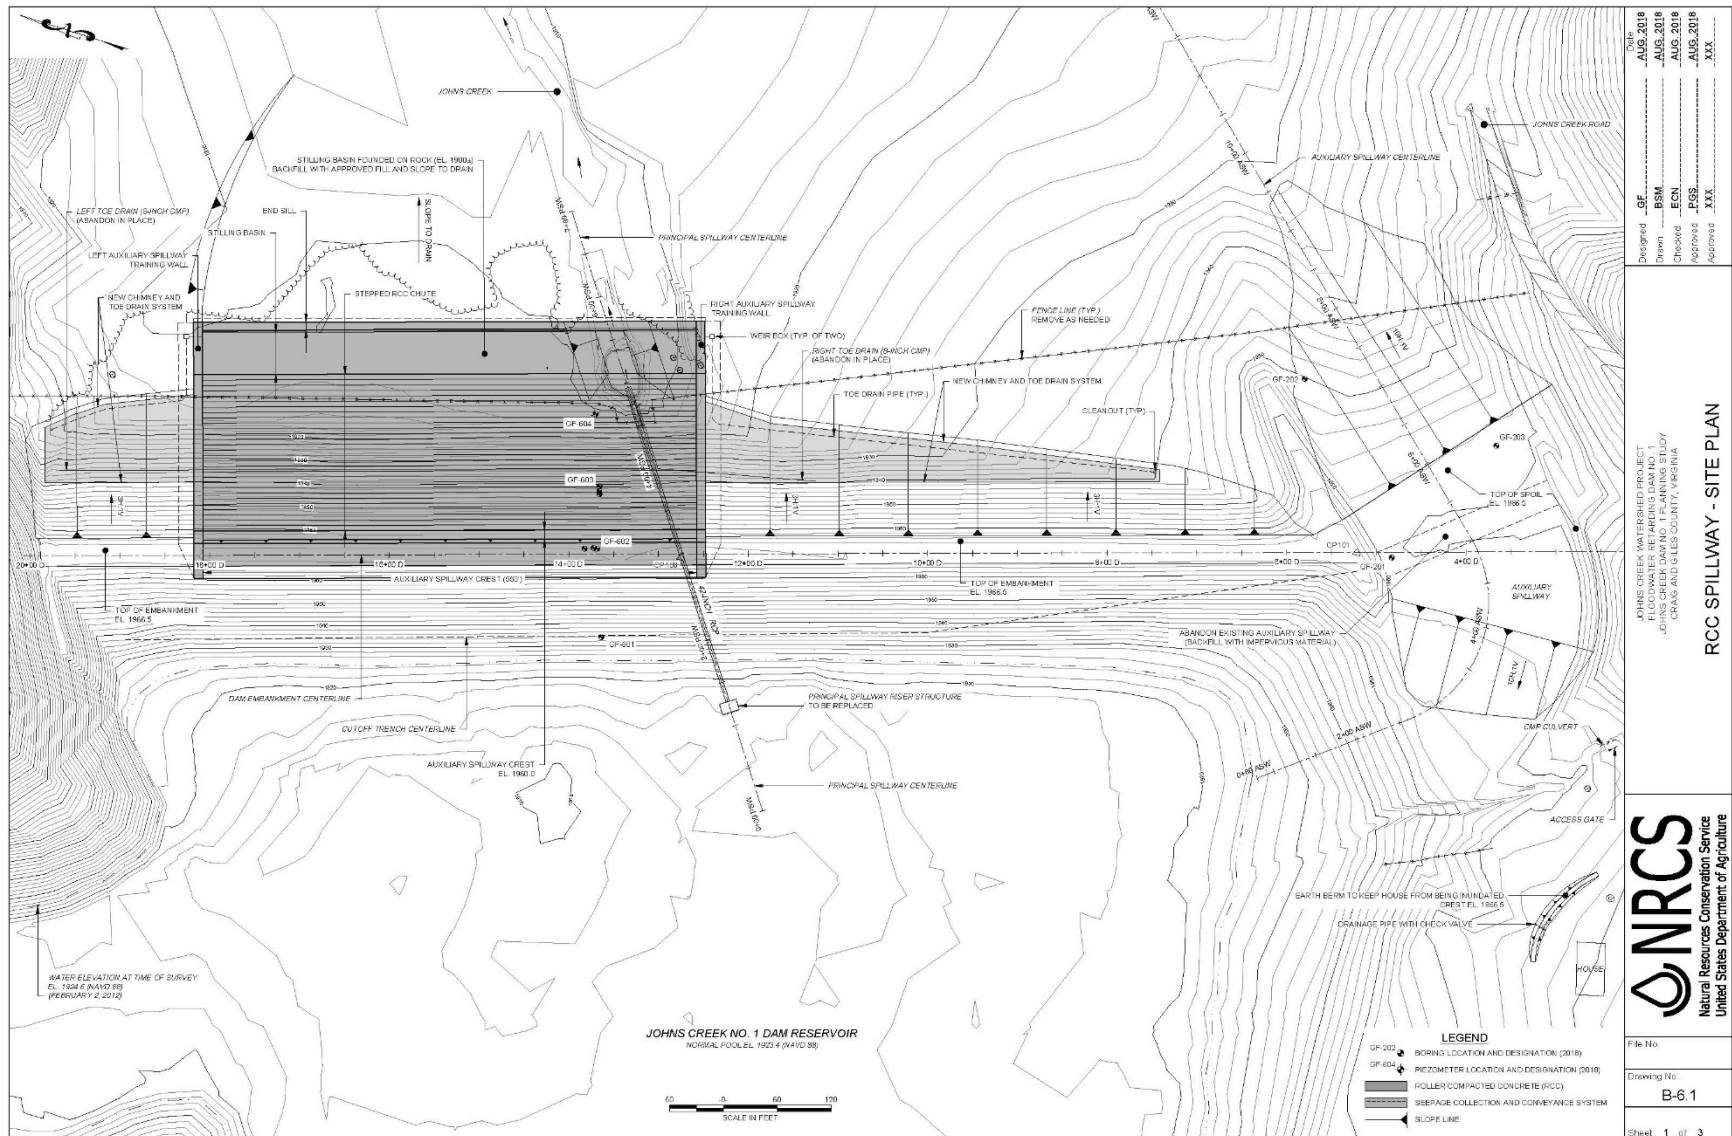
Alternative 3 – 370-foot-wide RCC Spillway on the embankment with 2-foot embankment raise.
